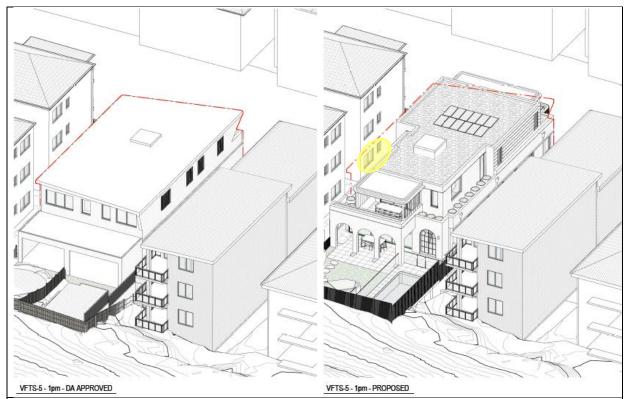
View front the sun, 21 June, 1pm showing the DA approved building (left) and the subject proposal (right). The windows that will receive solar access as a result of the proposed amendments are highlighted.
